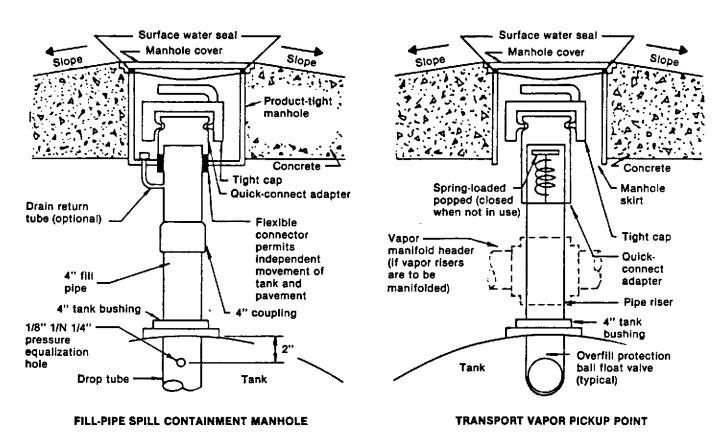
Typical Piping Details: Fill-Pipe Spill Containment Manhole and Transport Vapor-Pickup Point
